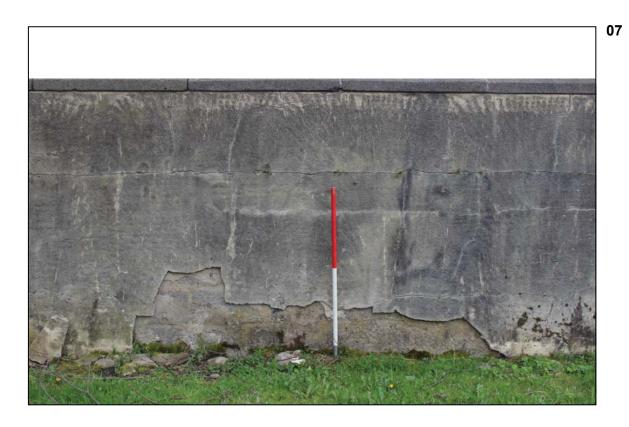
West facing elevation of early generation concrete block wall, from the south. Scale 1.0m.
